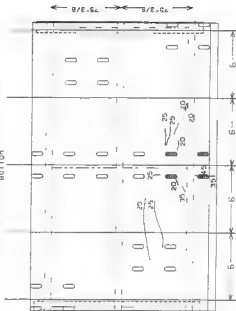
Bottom Cracking Pattern (Fourth Bridge - Test No. 4)
